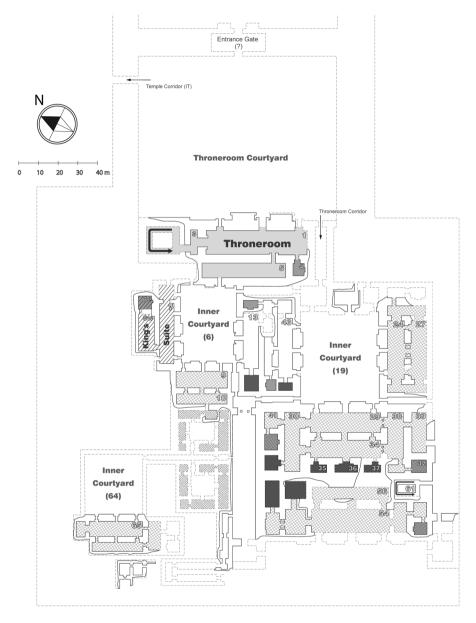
Floorplan of Southwest Palace in Nineveh. Drawn by author, based on Layard 1853b: pl. 71.
